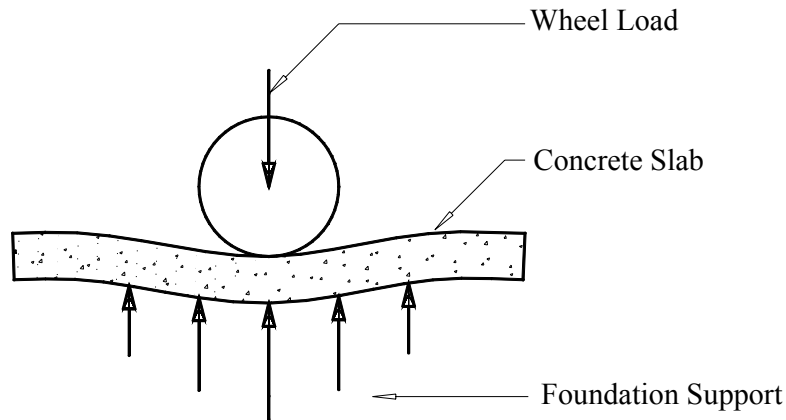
TRANSFER OF WHEEL LOAD TO FOUNDATION IN RIGID PAVEMENT STRUCTURE.
